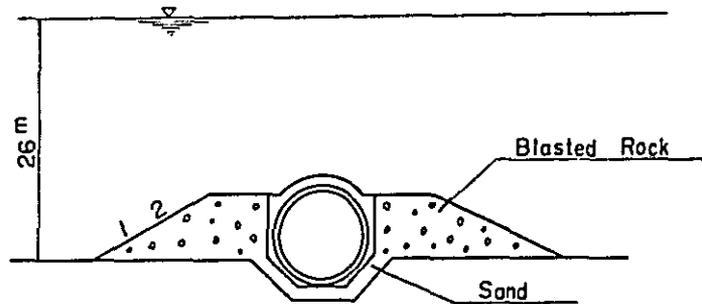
SUBMERGED TUNEL(CROSS SECTION)
